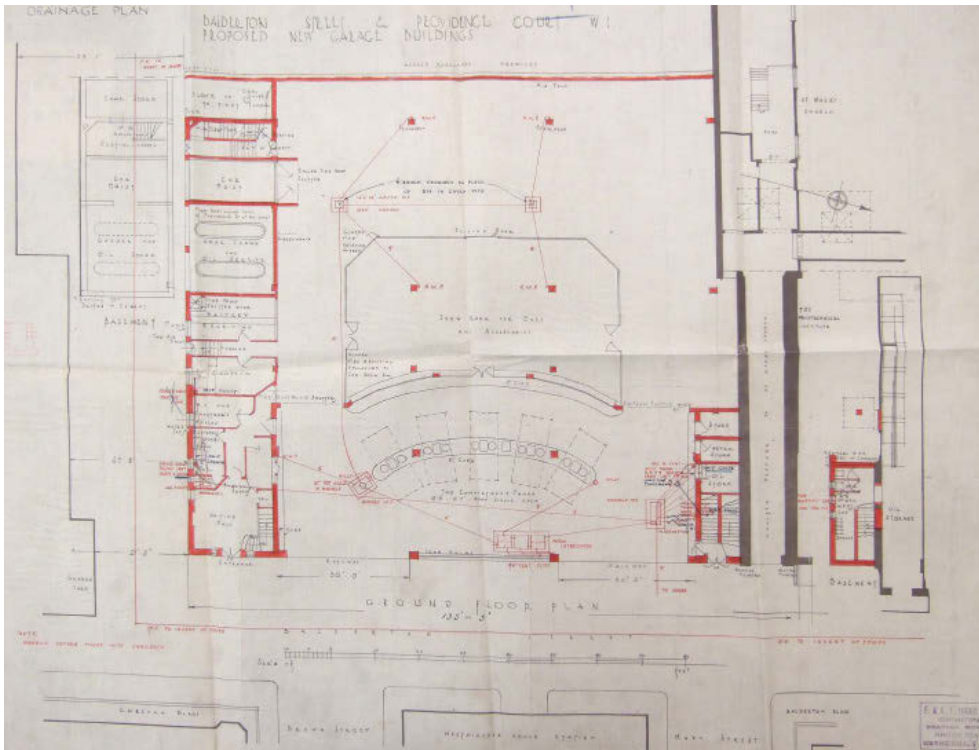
Architect's plan of the ground floor and, on the extreme right, the basement, 1925 (Heyne Tillett Steel 2009)
